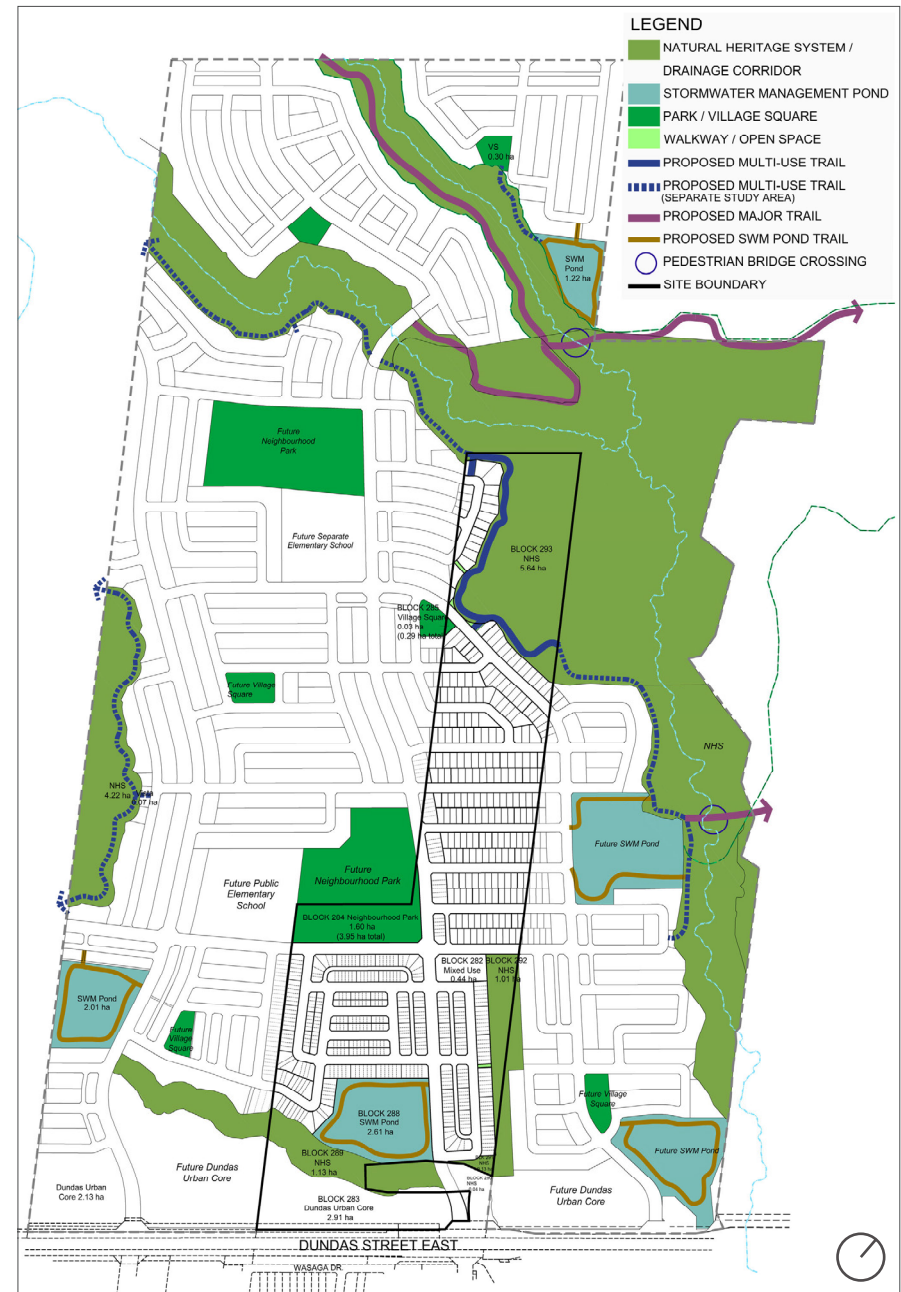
Conceptual plan depicting proposed trail locations within the Joshua Creek site area. Plan based on 2008 North Oakville East Trails Plan (subject to change pending approval of a new trails plan)
